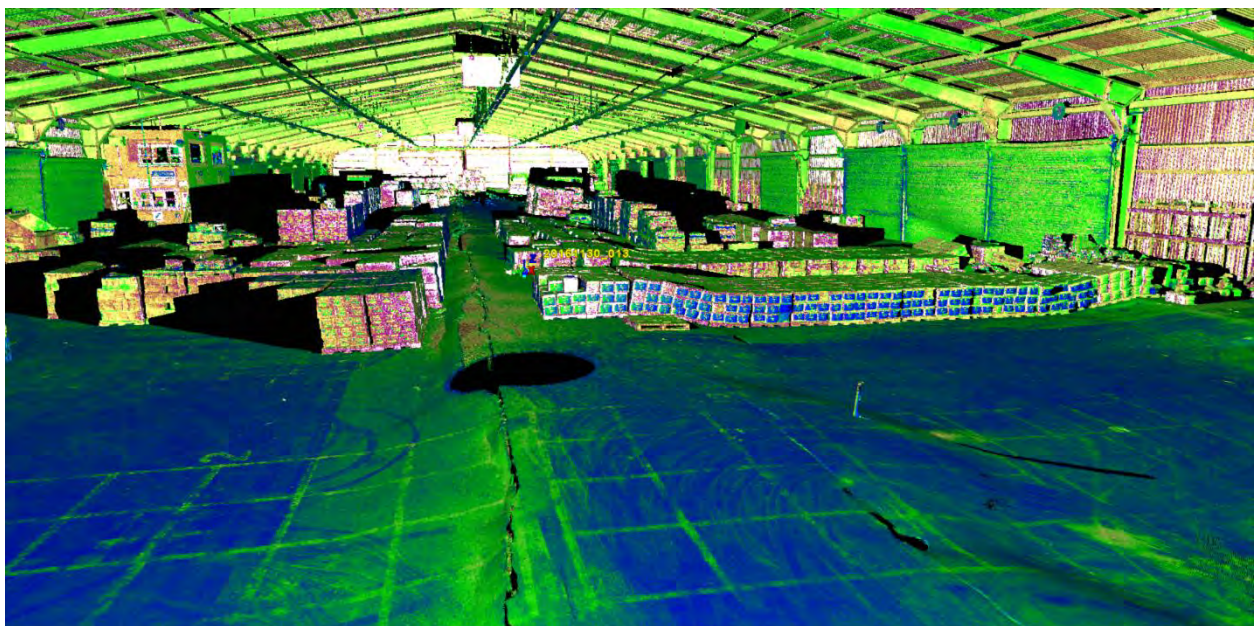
LiDAR scan obtained inside Building S37 showing cracking and settlement of the pavement around the buried precast concrete seawall (up to 550 mm of differential settlement occurred).
